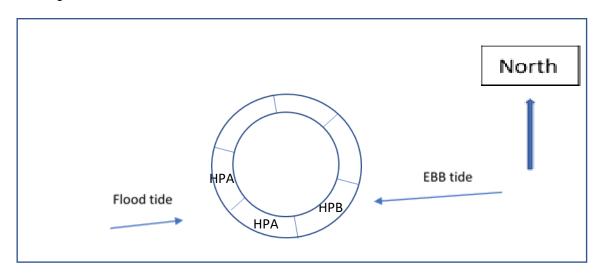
Plan view of HP intake caisson, showing HPB intake sector; the HPA intakes were in the South and South West sectors.
